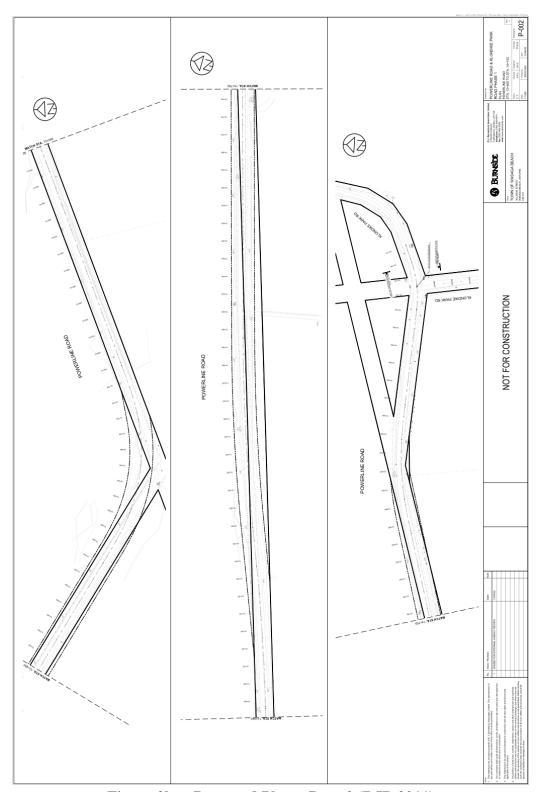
Proposed Plan – Page 2 (RJB 2011)
